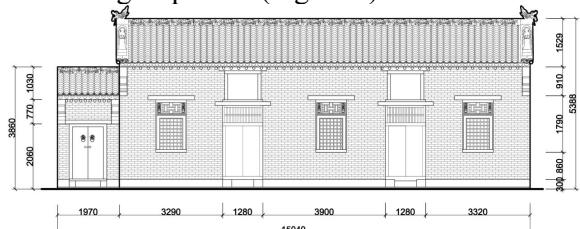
Elevation Drawing of the Wing Room at the Former Site of Chen Geng's Command Post
